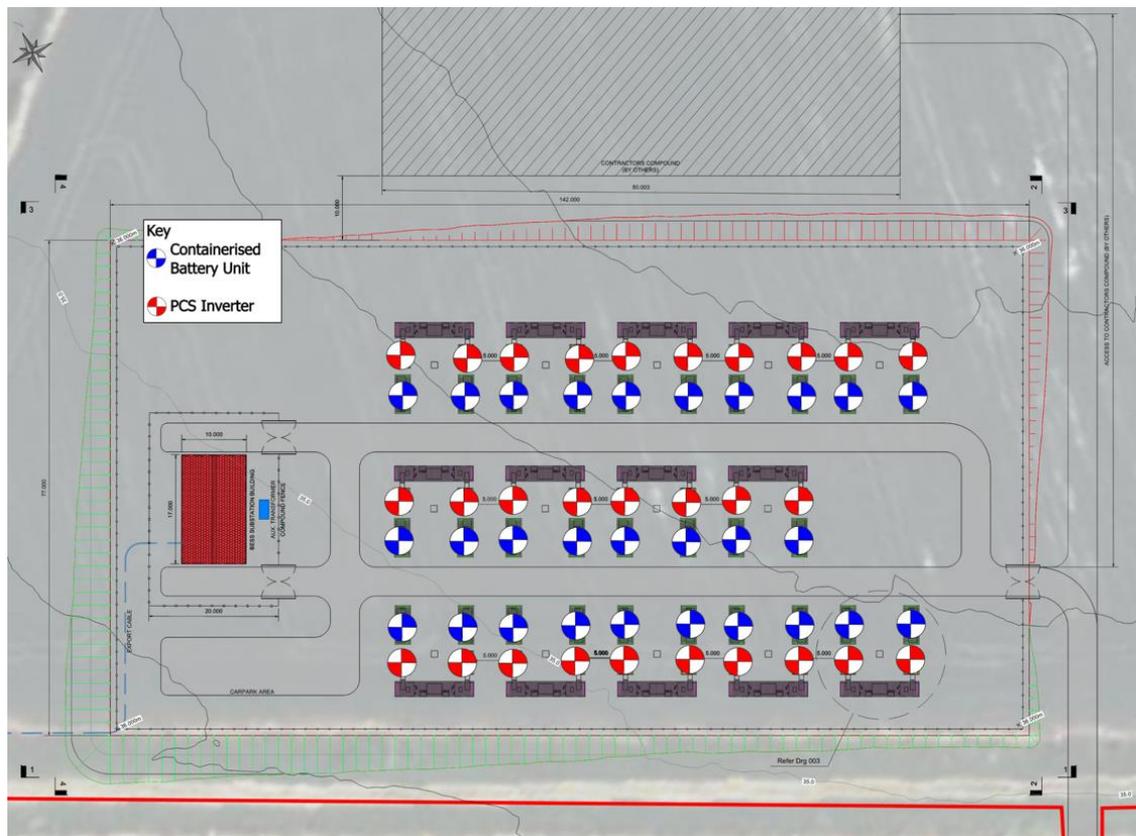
Proposed Layout of Six Oaks Renewable Energy Park Battery Storage Area
